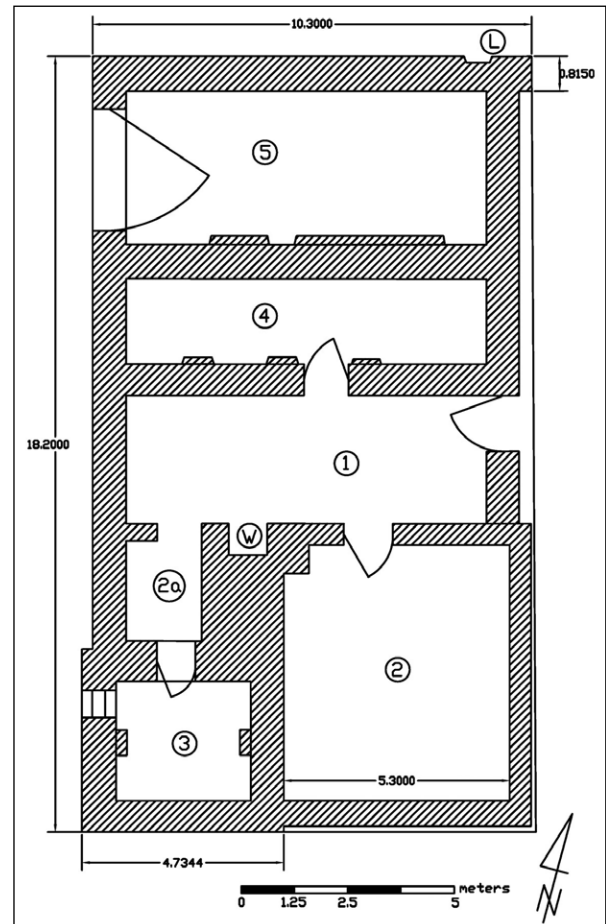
Kopaniec: plan of the excavated house (© Anna Łuczak).
